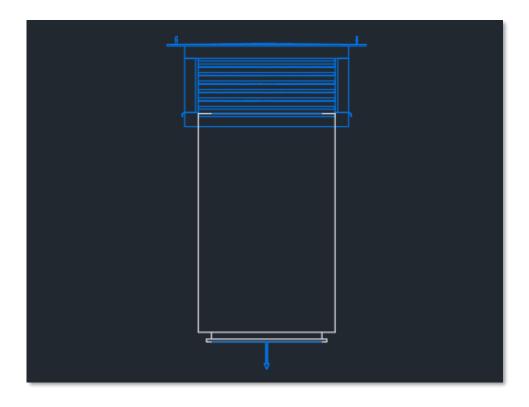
Outdoor supply roof hood and inlet products 3D geometry in AutoCAD drawing
